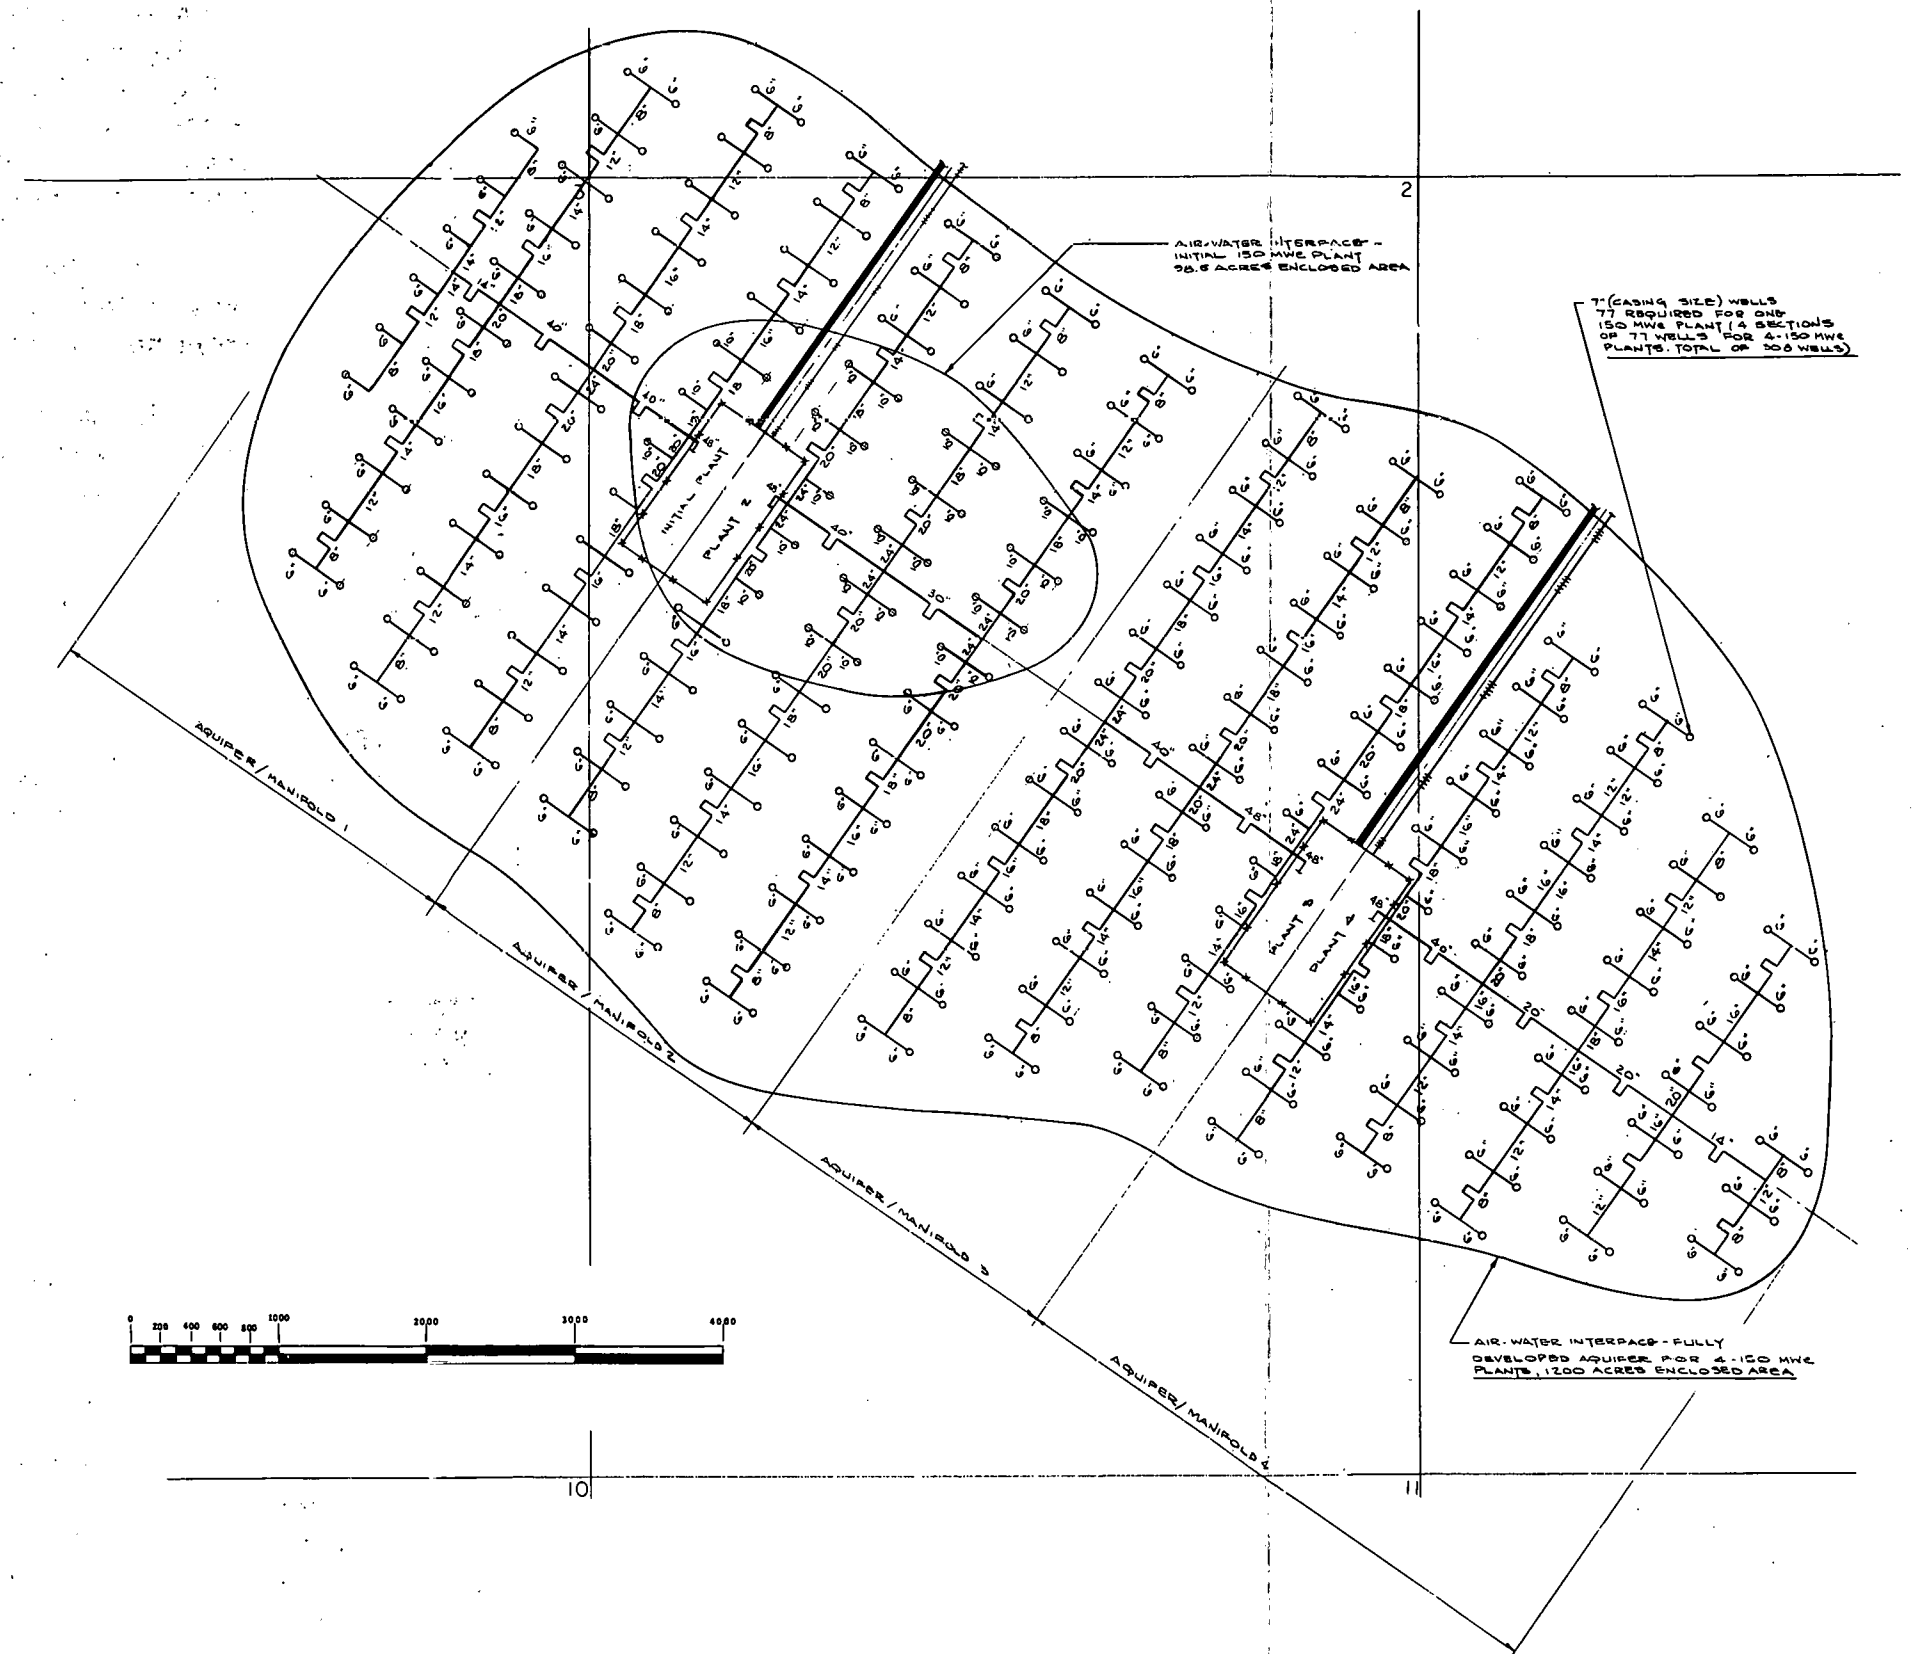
Layout of Equilibrium 600 MW Plant at the Brookville Site
